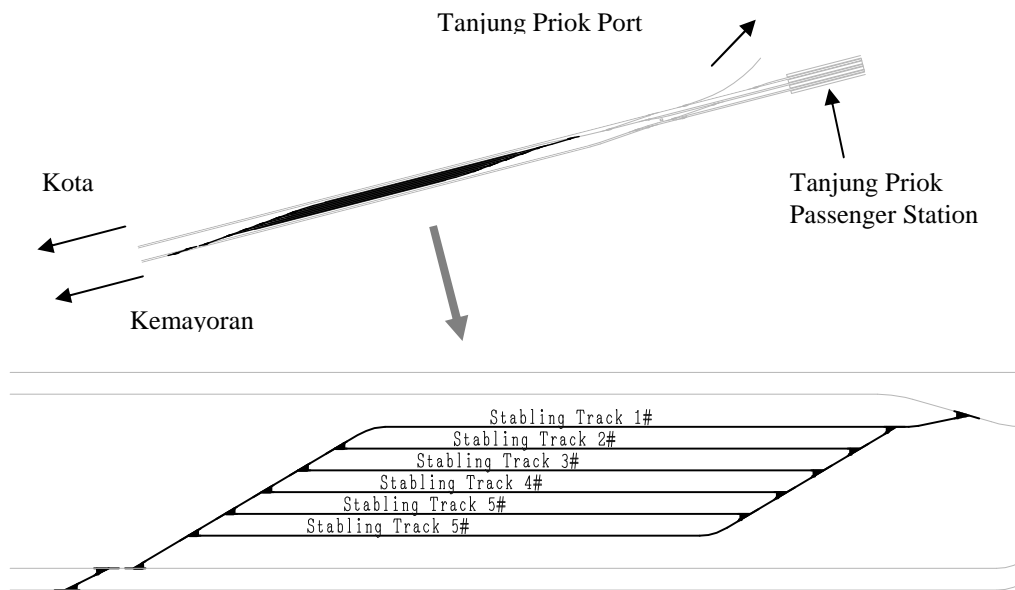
Proposed Track Layout of Tanjung Priok Yard
